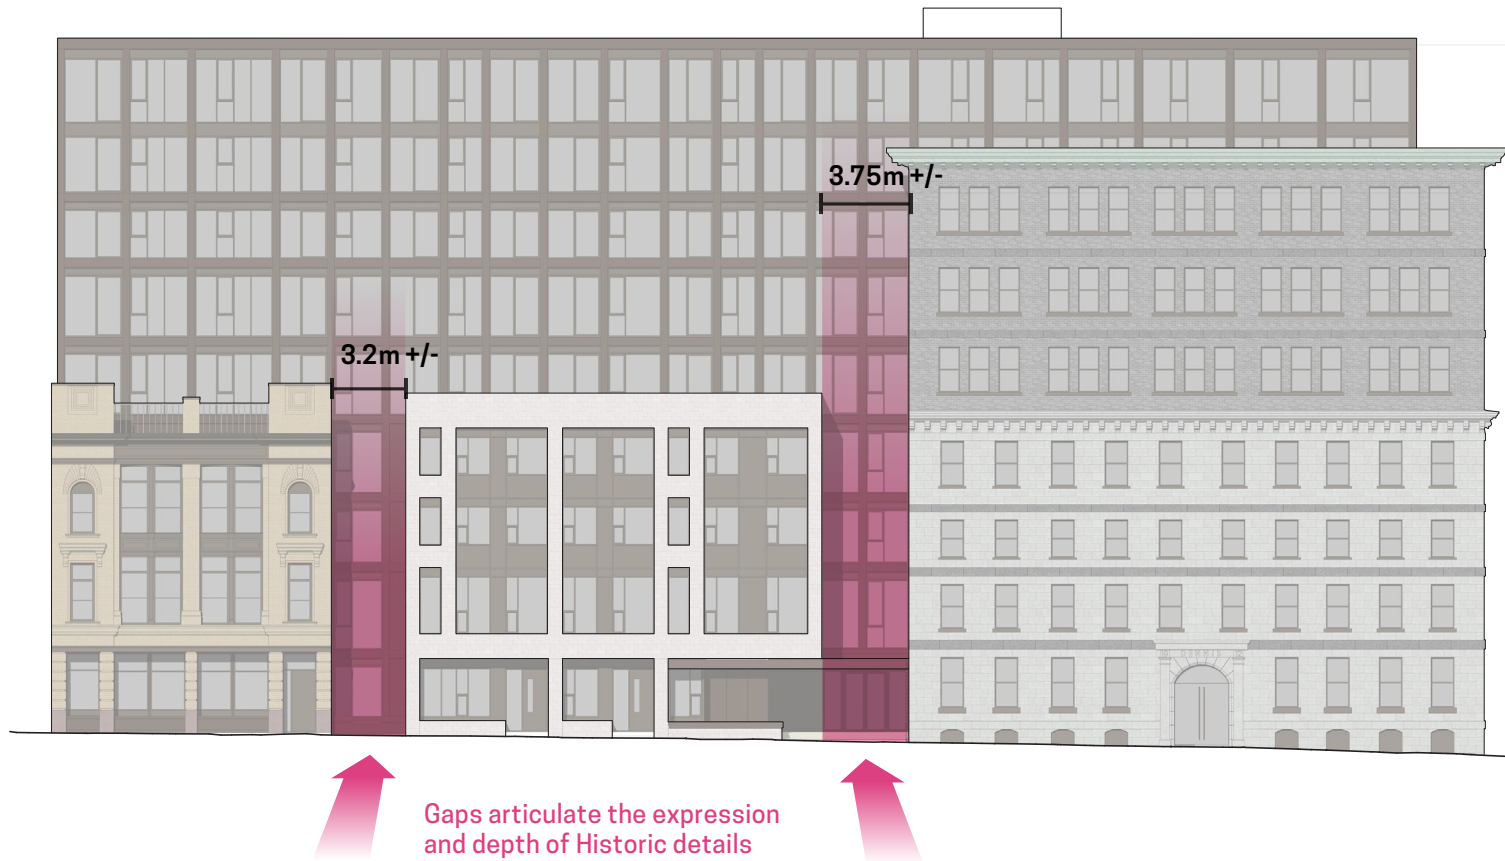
c Streetwall Width: New construction setbacks on Granville to maintain visual prominence of heritage resources
